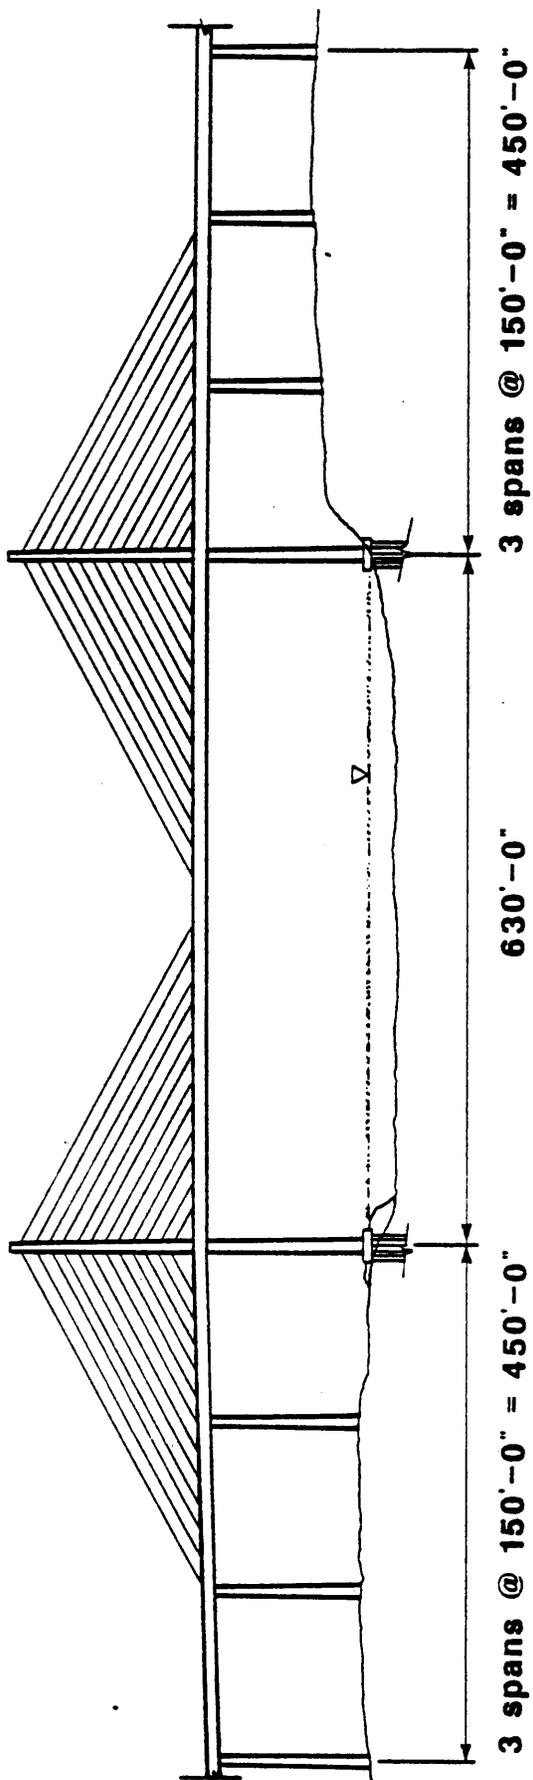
Elevation of the river span of the I-295 James River Bridge and continuous side spans.
